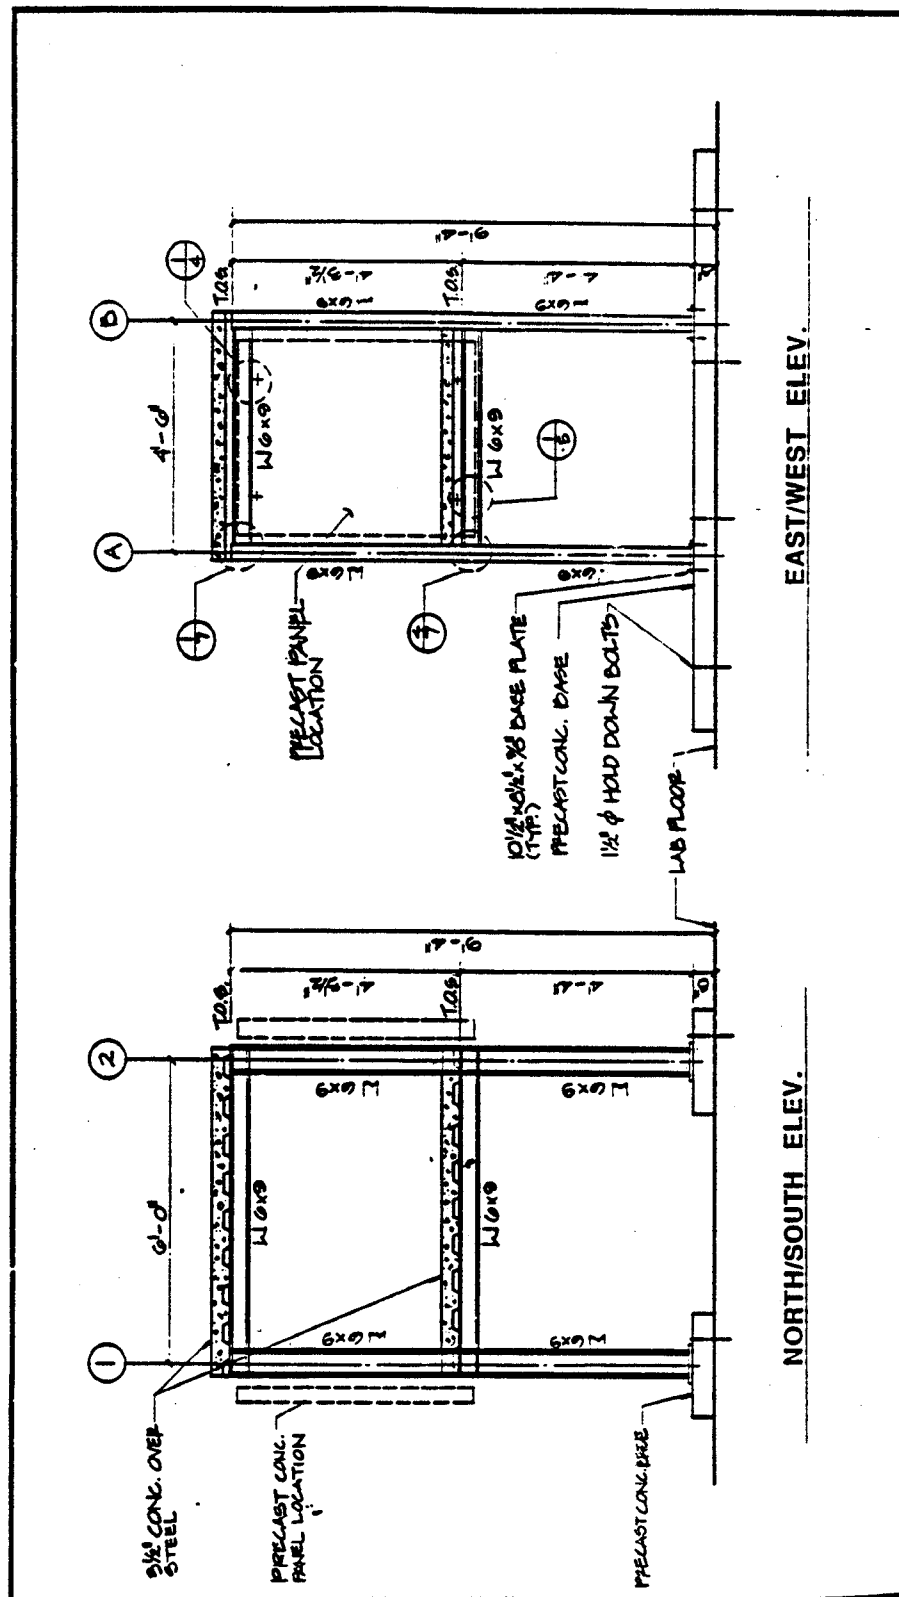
Test III: One drawing of the dynamic test set-up for precast facade/cladding panels and connections on a model two-story steel moment-resisting frame structure (from Rihal [1988a]).
